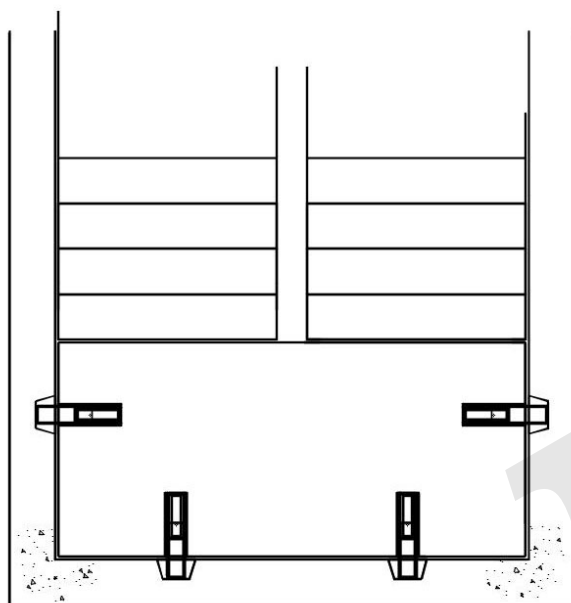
Plan view of example of sliding support arrangement with four connectors; two in side walls and two in back wall.
